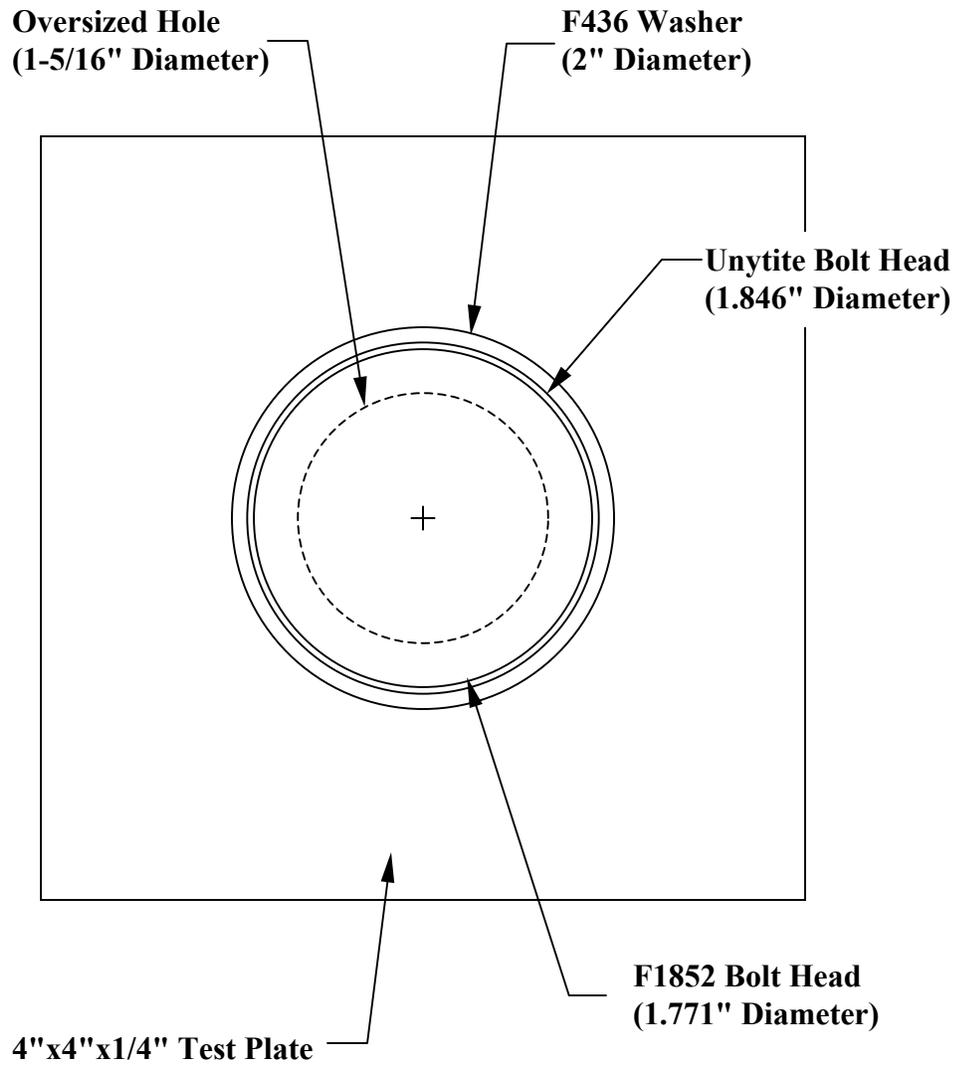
Bolt and Plate Layout for 1" Bolt in Oversized Hole
